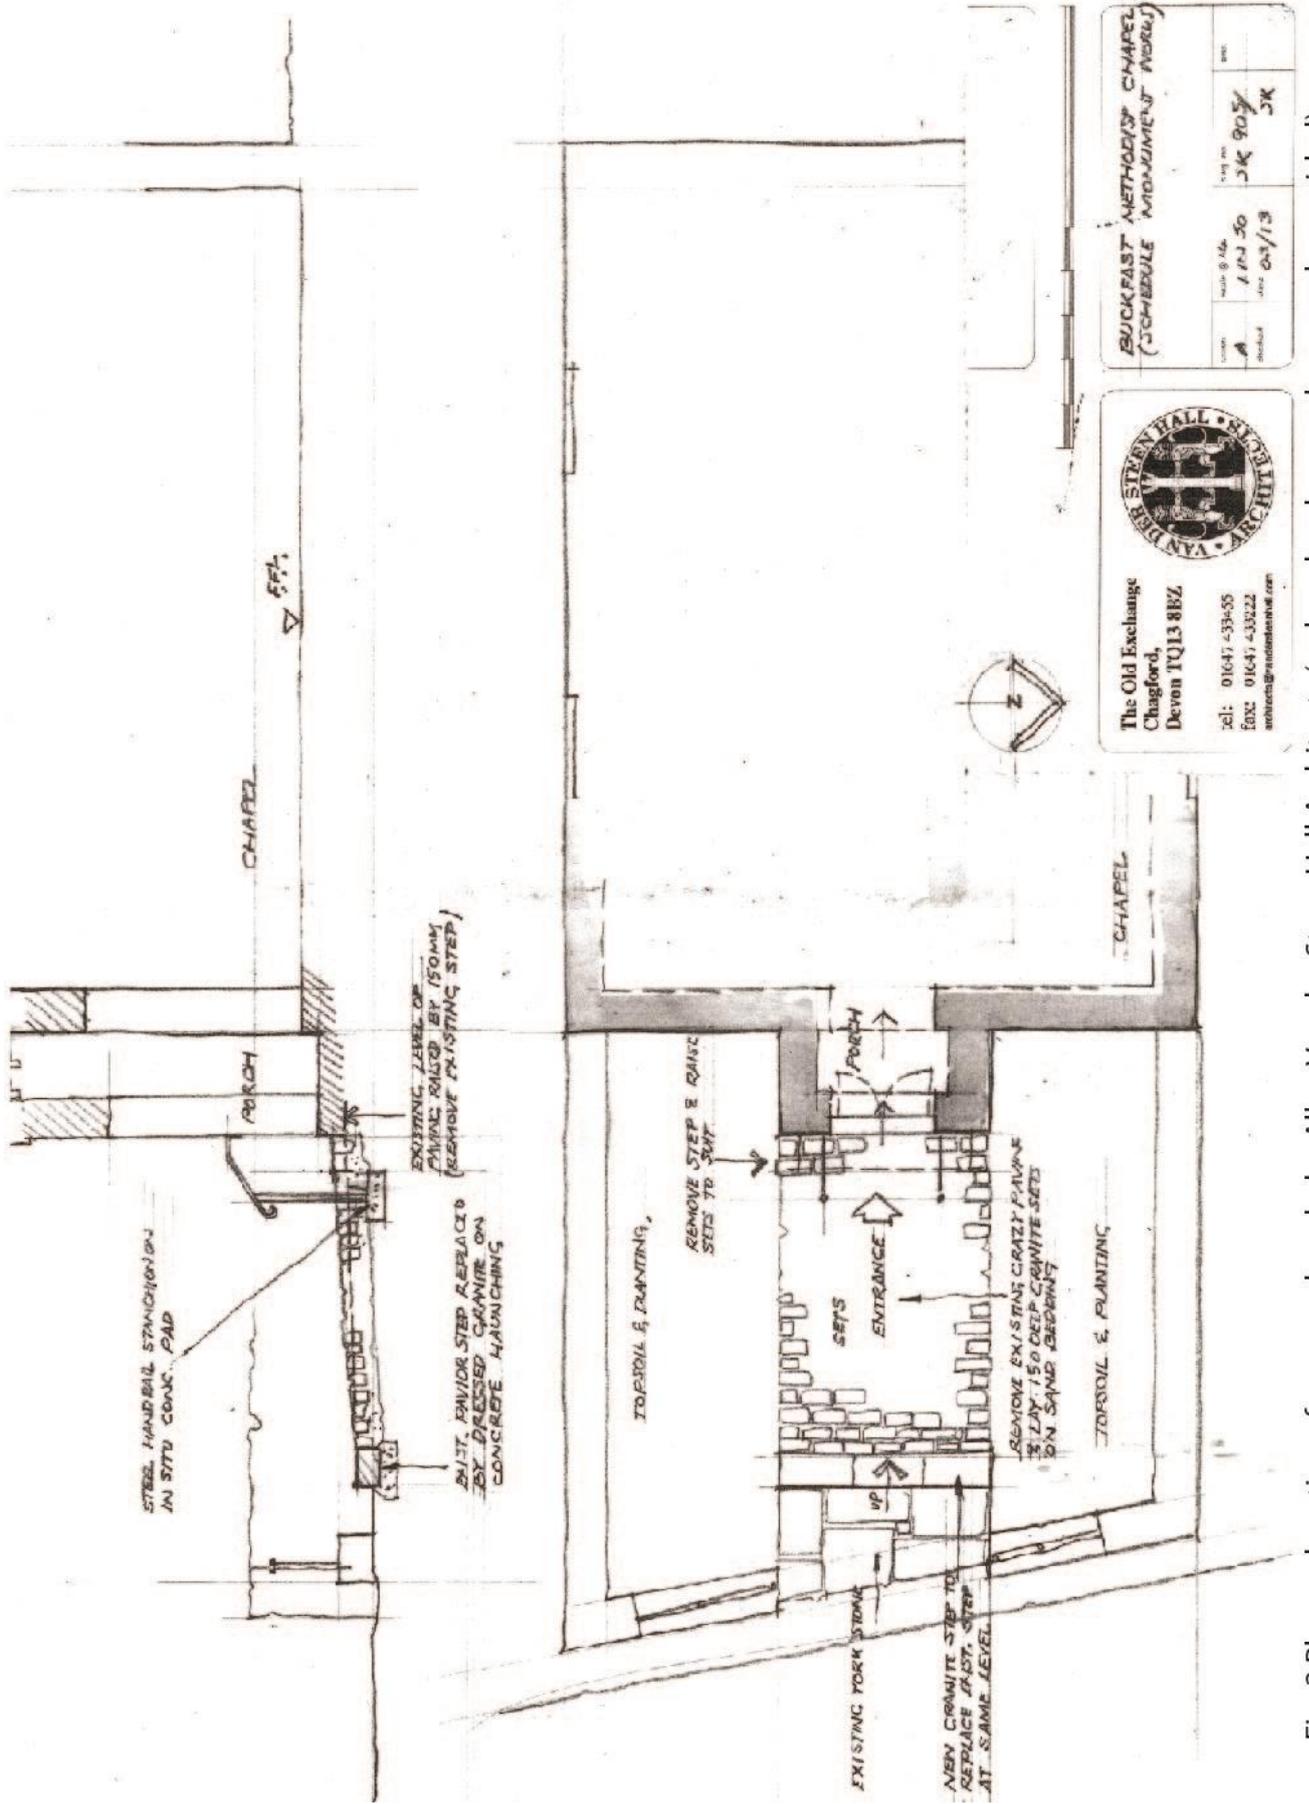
Plan and section of proposed works by Allen Van der Steen Hall Architects (reduced scale - see drawn scale provided).
